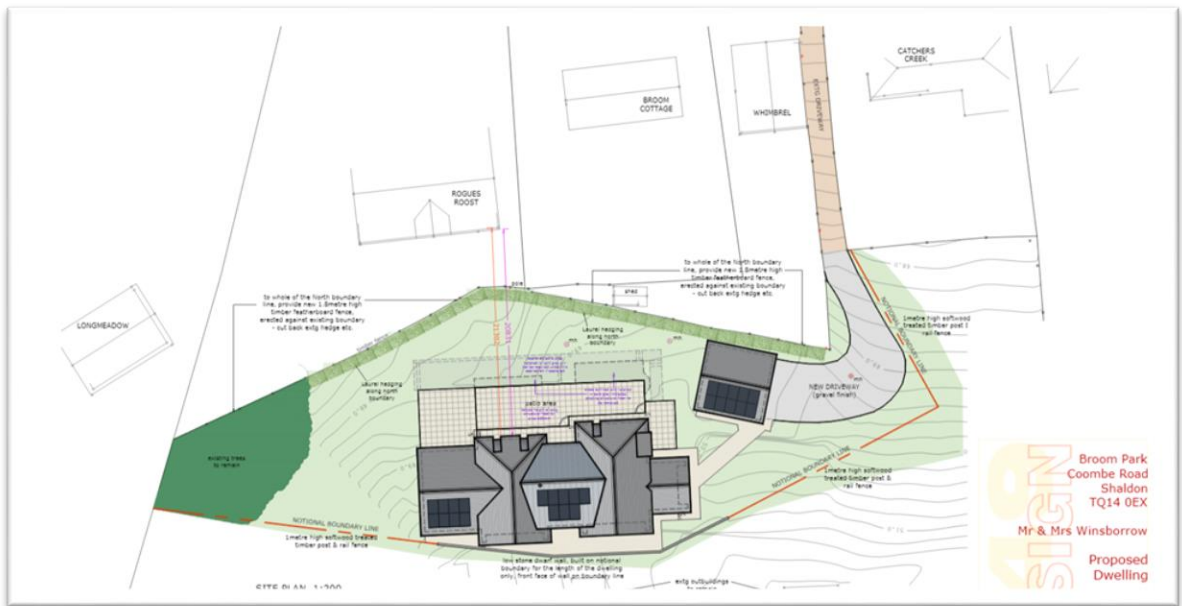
Site Plan as Proposed - Drawing Numbered 22.23.P31
